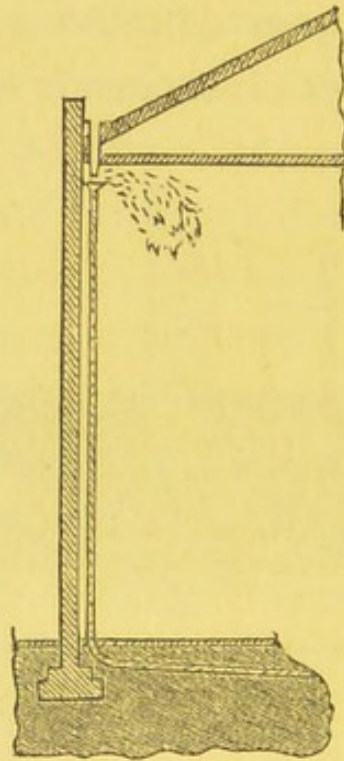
Rain-water pipe open under ceiling and ventilating drain into house.
